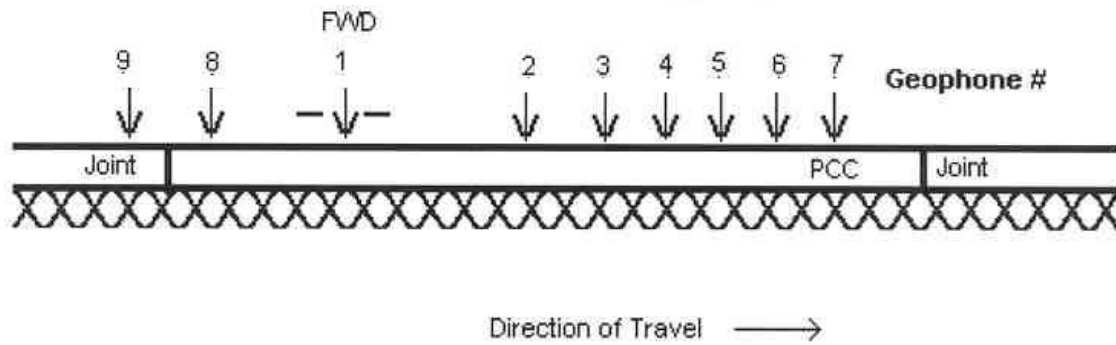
Geophone Arrangement for Testing Joints at Rigid Pavement
